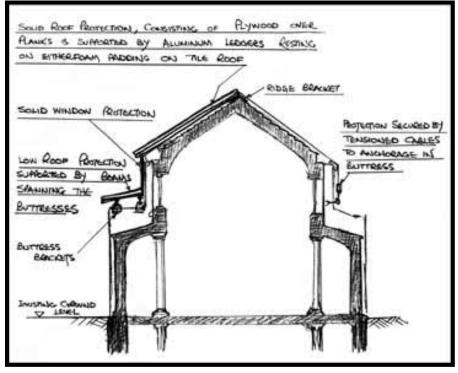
Before new construction was undertaken to the left of this church, a subcontractor was hired to design a protective system for the tile roof and clerestory windows. Drawing: Alan Shalders, Universal Builders Supply, Inc.
